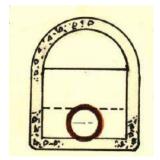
Semi-circular shaped storm drain pipe-in-pipe tunnel. Small sanitary pipe in storm drain's invert. Segment M-TUN-1. constructed 1960-1961.
